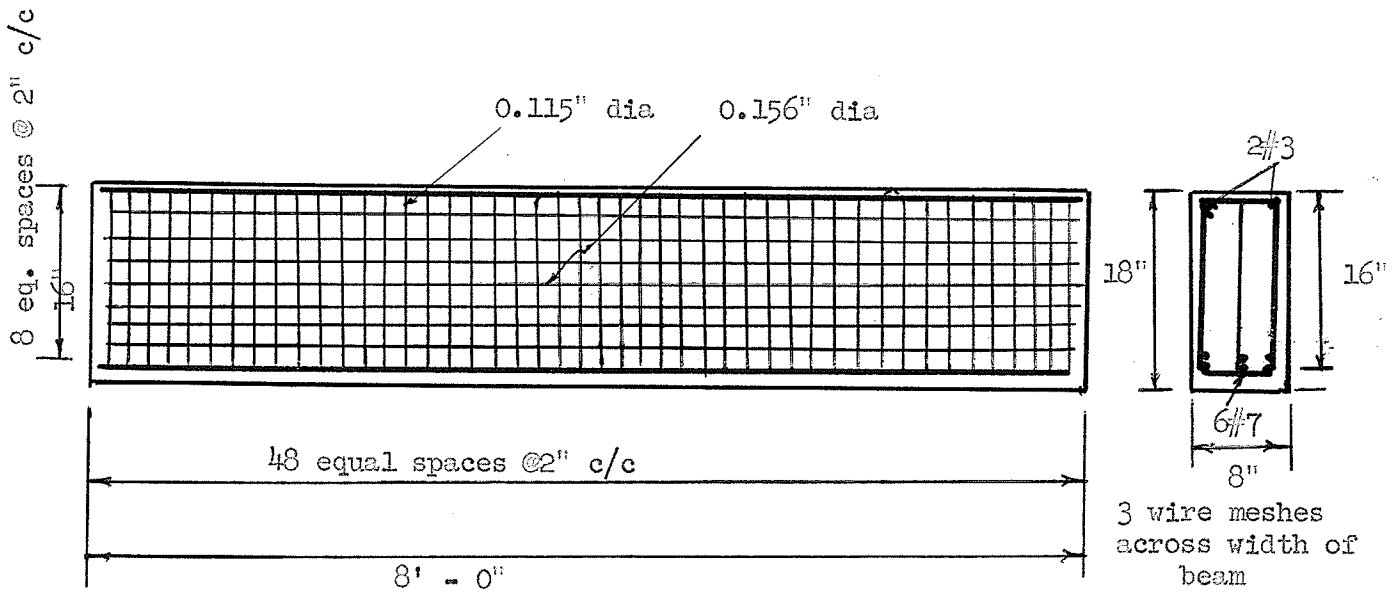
SKETCH OF REINFORCEMENT BEAM 6
